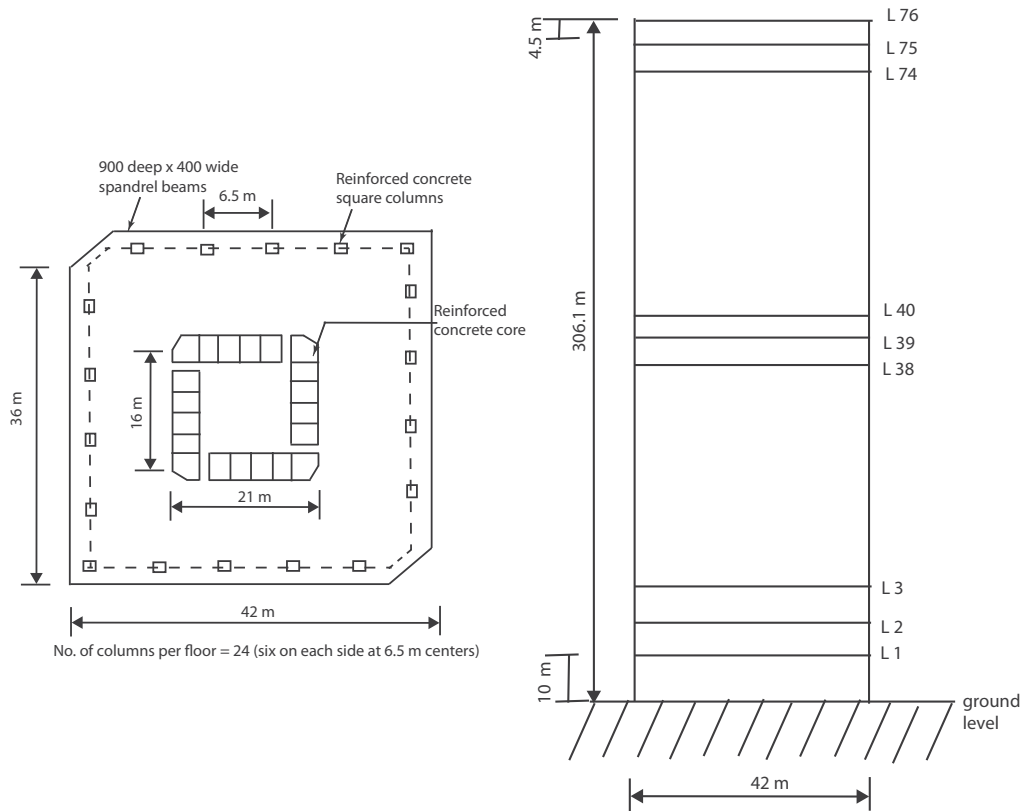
(a) Plan view and (b) Elevation view of 76-floor building
